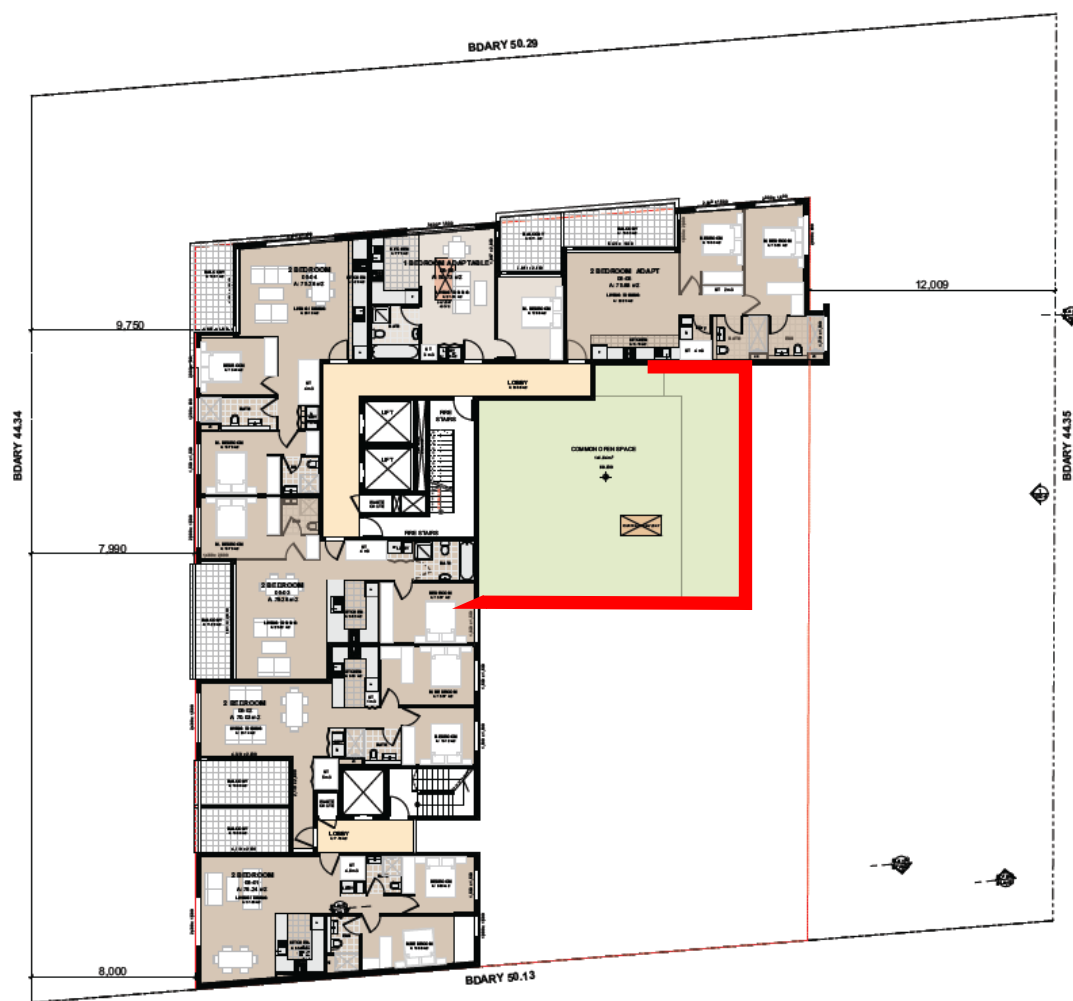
Proposed Fifth Floor Communal Area Sound Barrier
